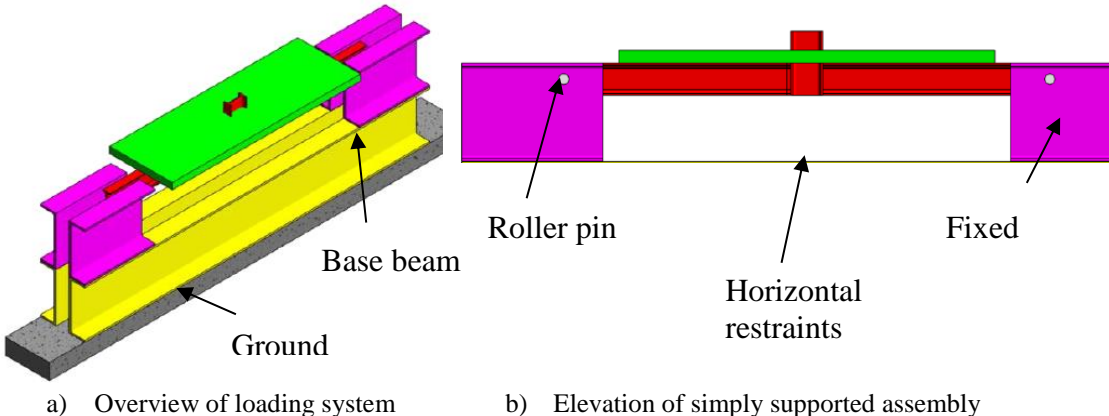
Schematic of the test setup showing the composite beam assembly
